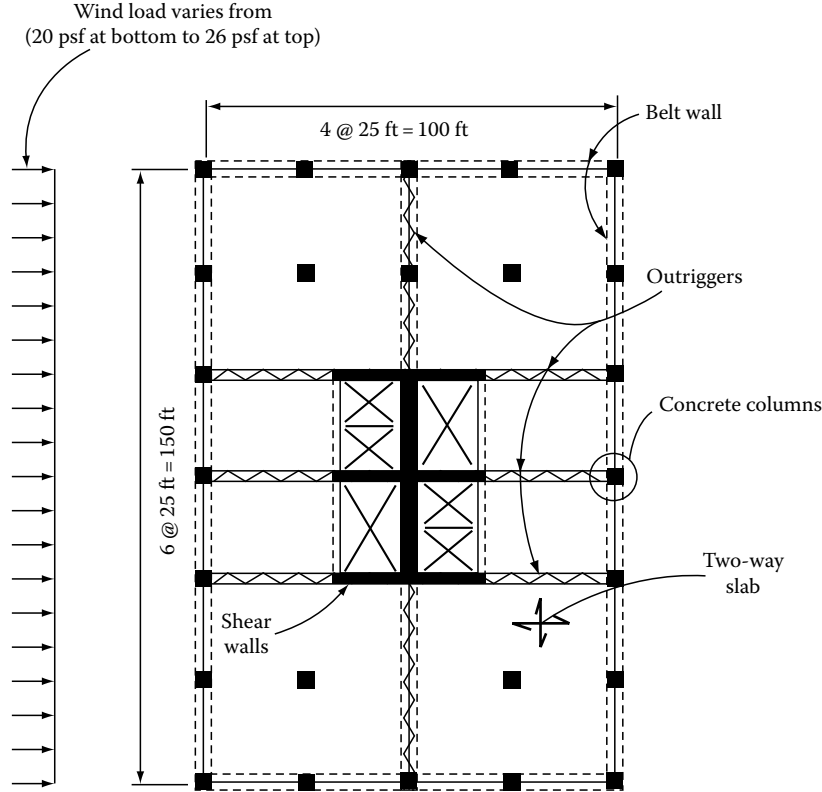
Schematic plan of a concrete building with outriggers and belt walls at a single level.
